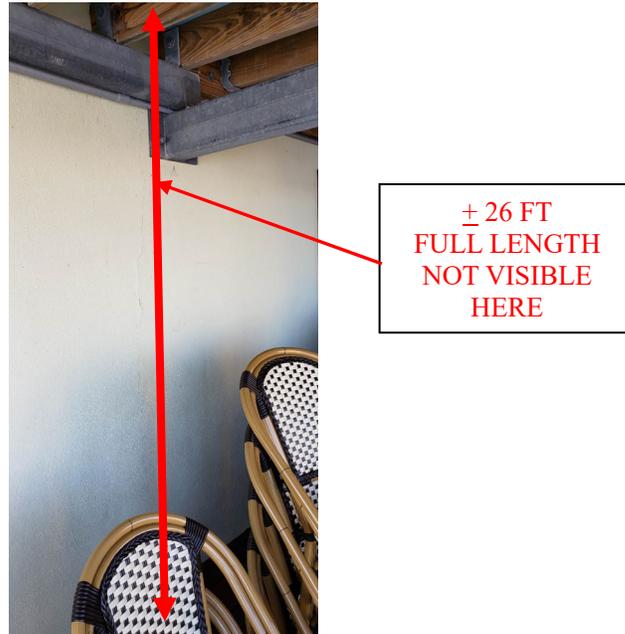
Location 19: Approximately 26 ft long new 16x8 concrete column. See detail 1/S101.
